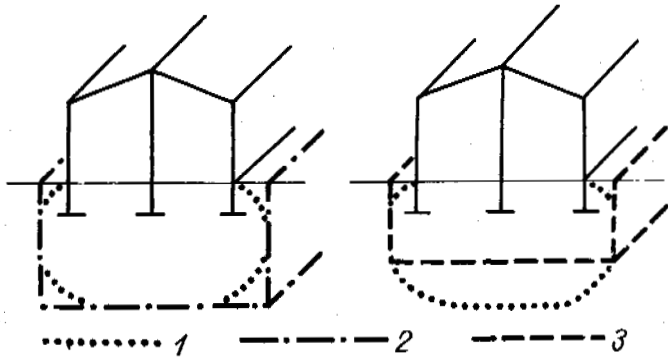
Volume of preconstruction thawing of foundation beds: 1. Profile of estimated thawing bowl under the building; 2. Preconstruction thawing to full depth of thawing bowl; 3. Preconstruction thawing to partial depth of thawing bowl
